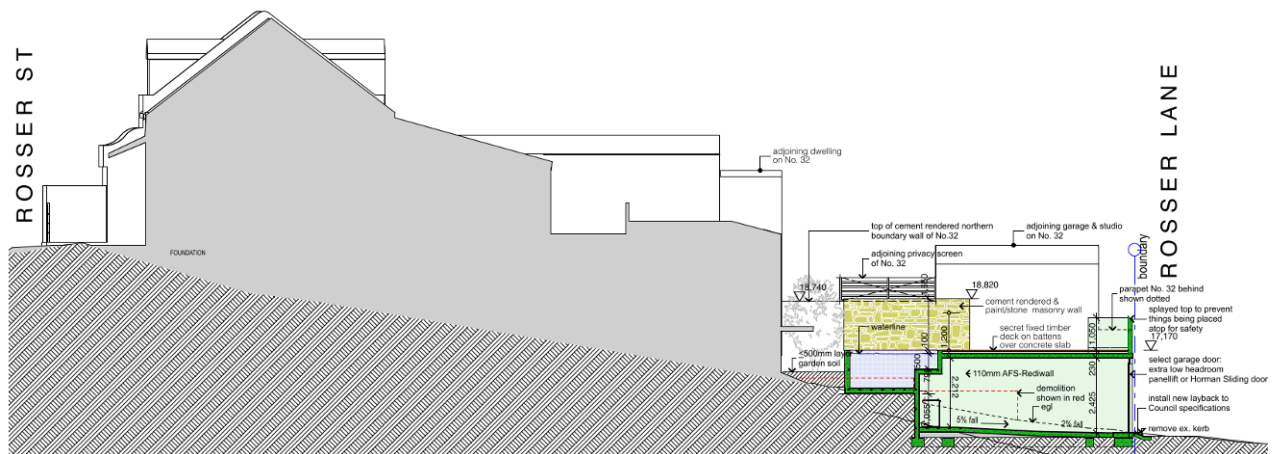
Proposed section at 34 Rosser Street Rozelle.
